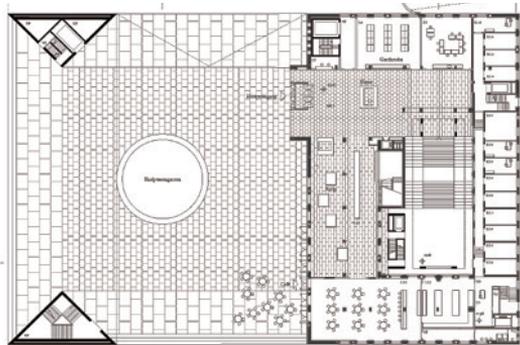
Ground level plan. *Second Place. Vienna History Museum Addition.
